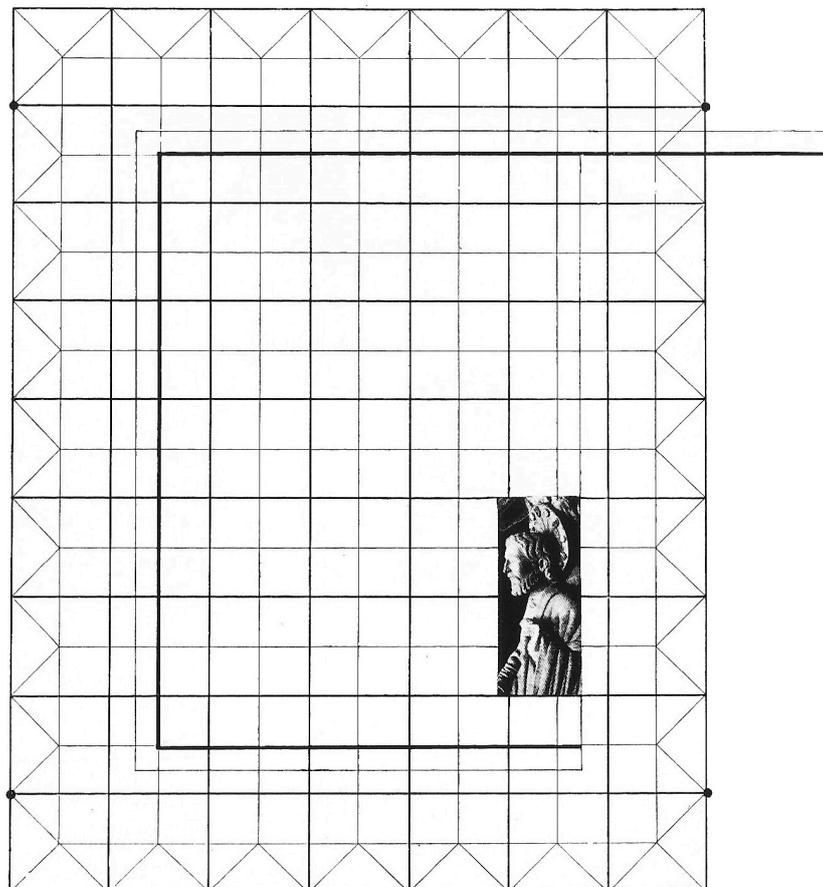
Chapel on St. James Way* (1954). Floor plan.
